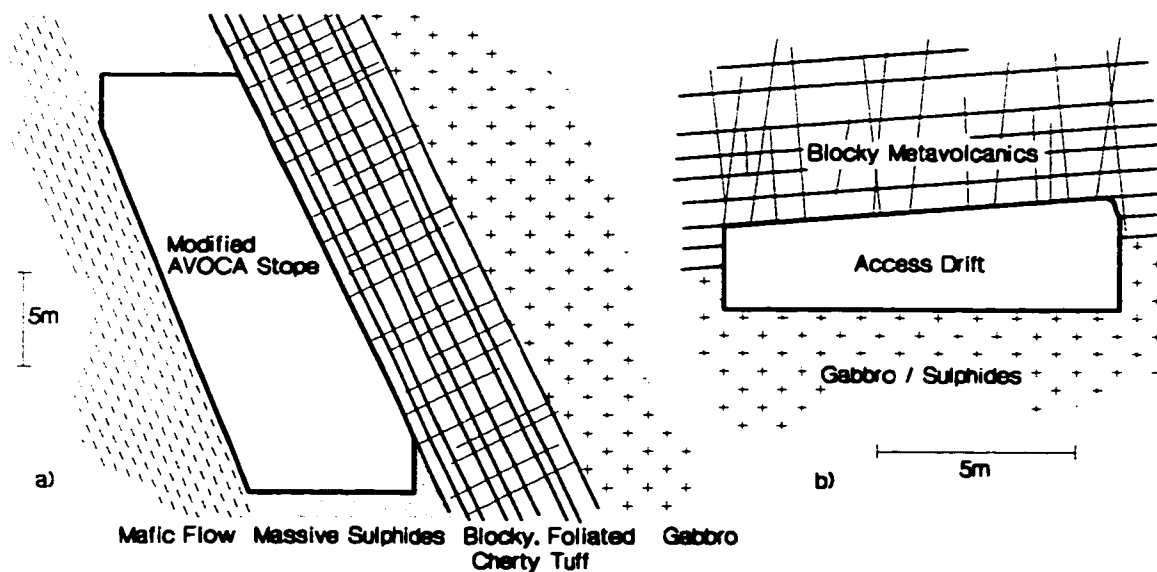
Voussoir beams encountered at a) Winston Lake Mine, Ontario, and b) North Mine, Sudbury.
